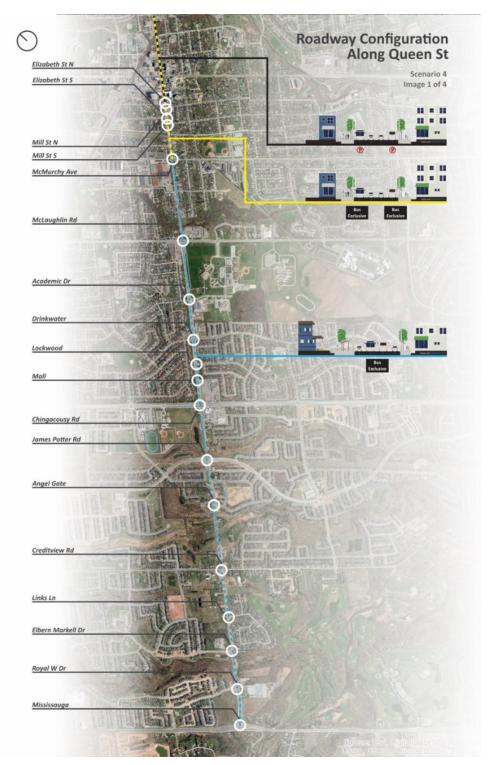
Scenario 4 road configuration, Mississauga Road to Mill Street North
